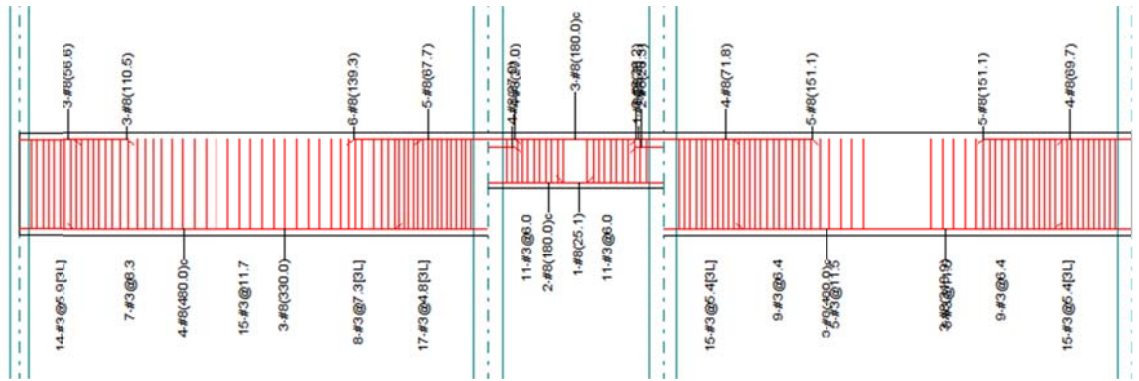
spBeam Column Line C Reinforcing Diagram (Lateral Loads)
